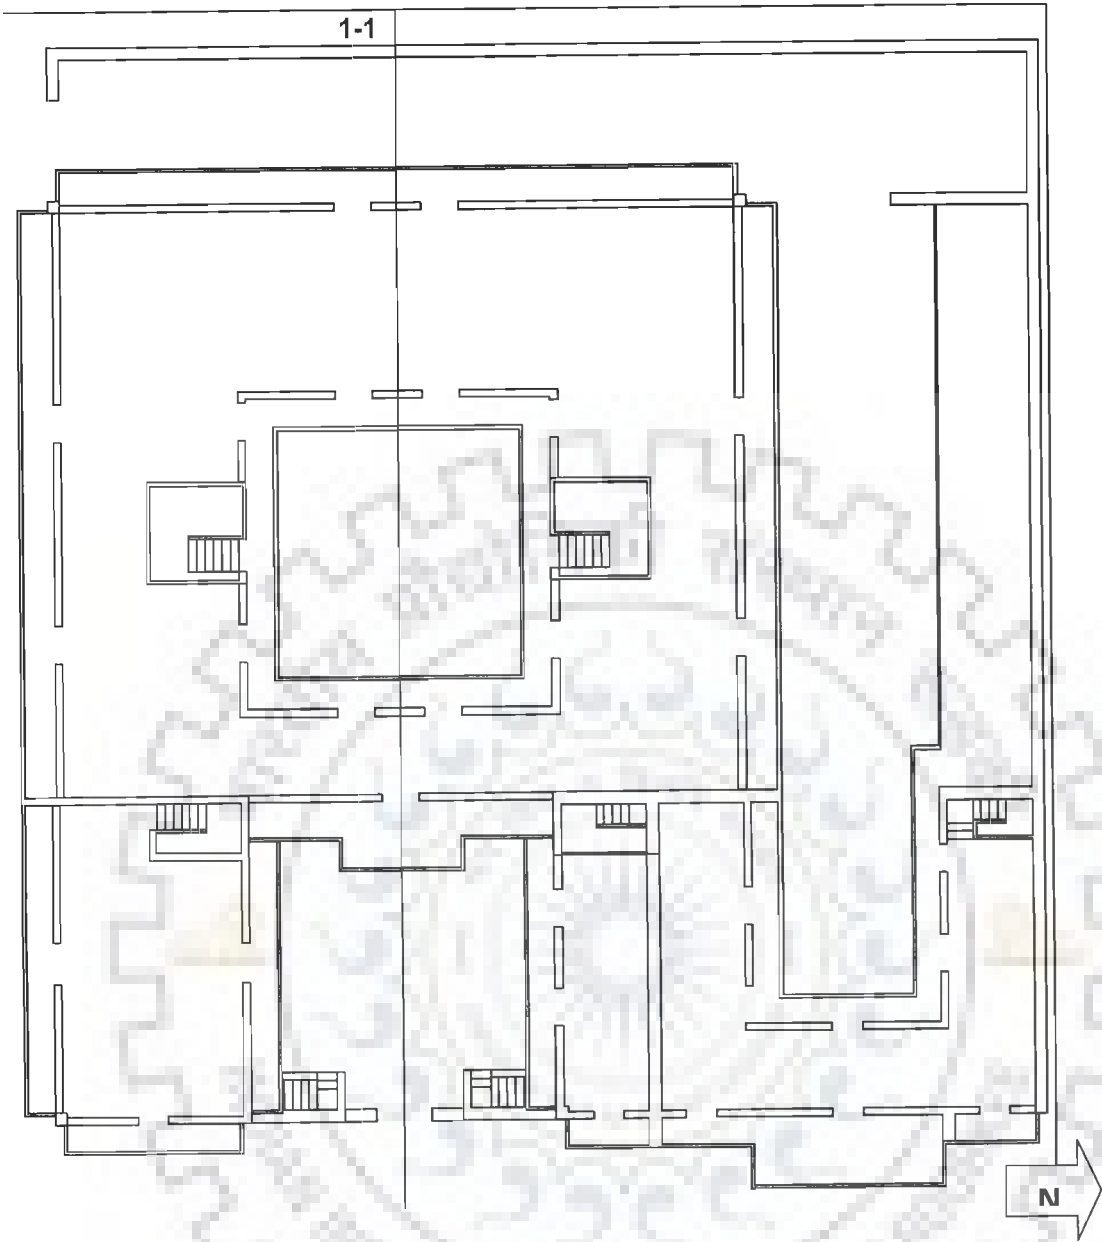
Mezzanine Floor Plan for Upper Ground Level
